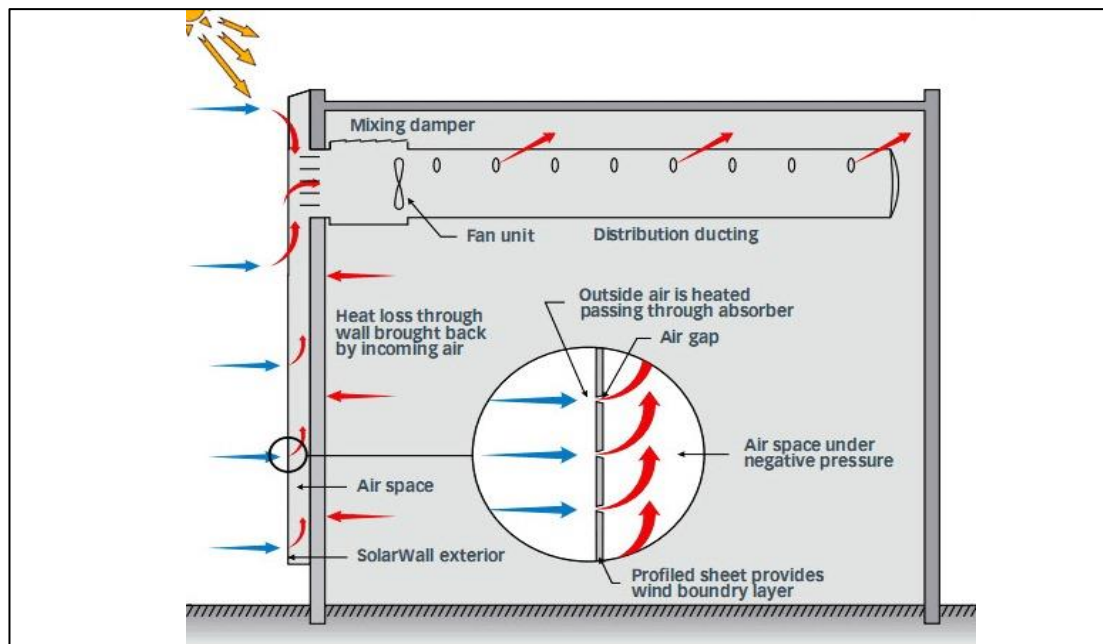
Typical TSC mechanism with rooftop HVAC unit (SolarWall n.d.)
